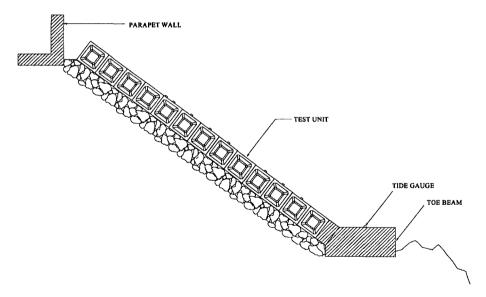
Typical cross-section of LaCollette Breakwater, Jersey, UK
